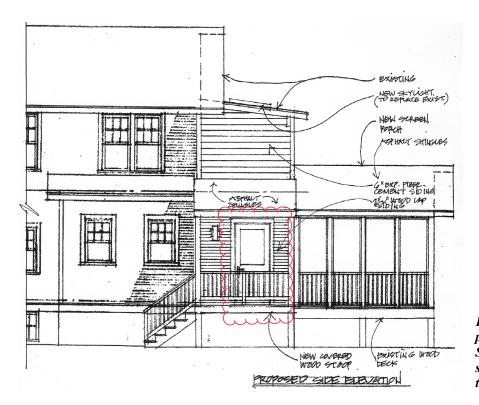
View of the proposed north elevation. Staff requests a specification sheet for the door noted with the red cloud.
